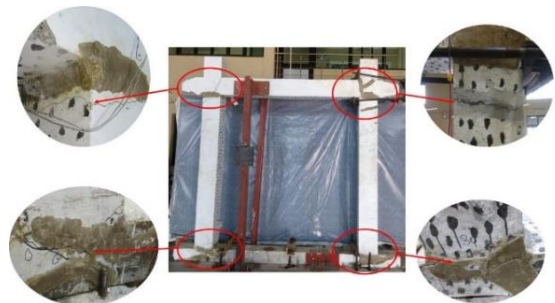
Failure cracks in epoxy retrofitted bare frame (DBFR-G)
